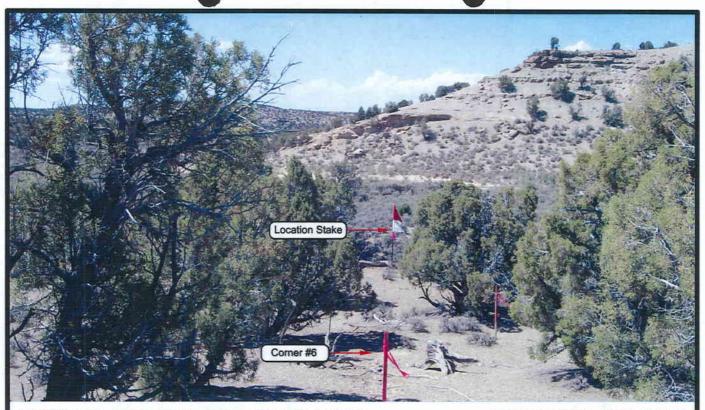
PHOTO VIEW: FROM CORNER #6 TO LOCATION STAKE
